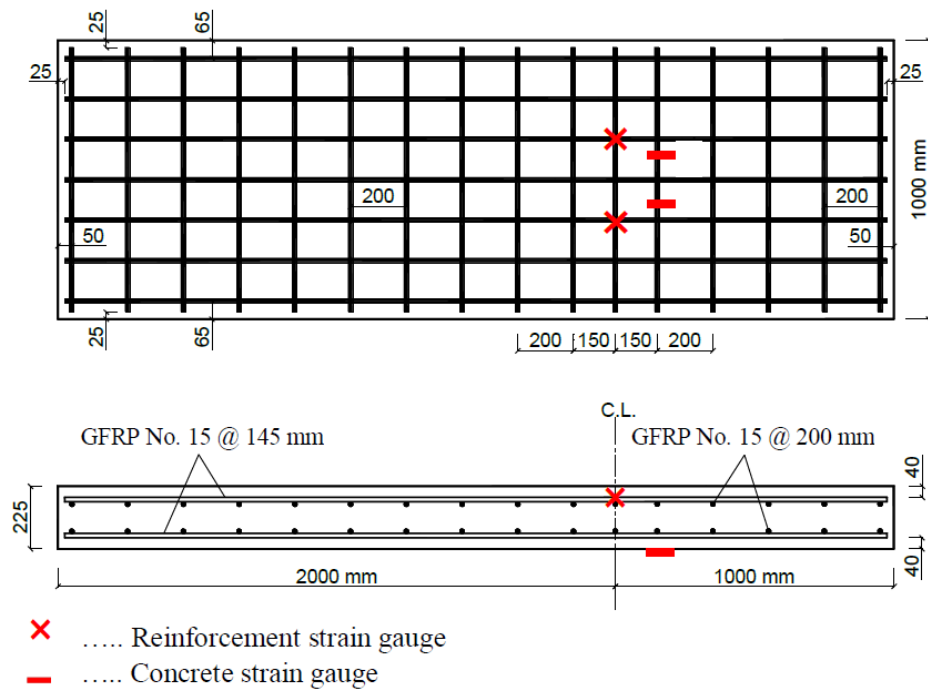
Locations of reinforcement and concrete strain gauges for reference specimen G-R-15-A
